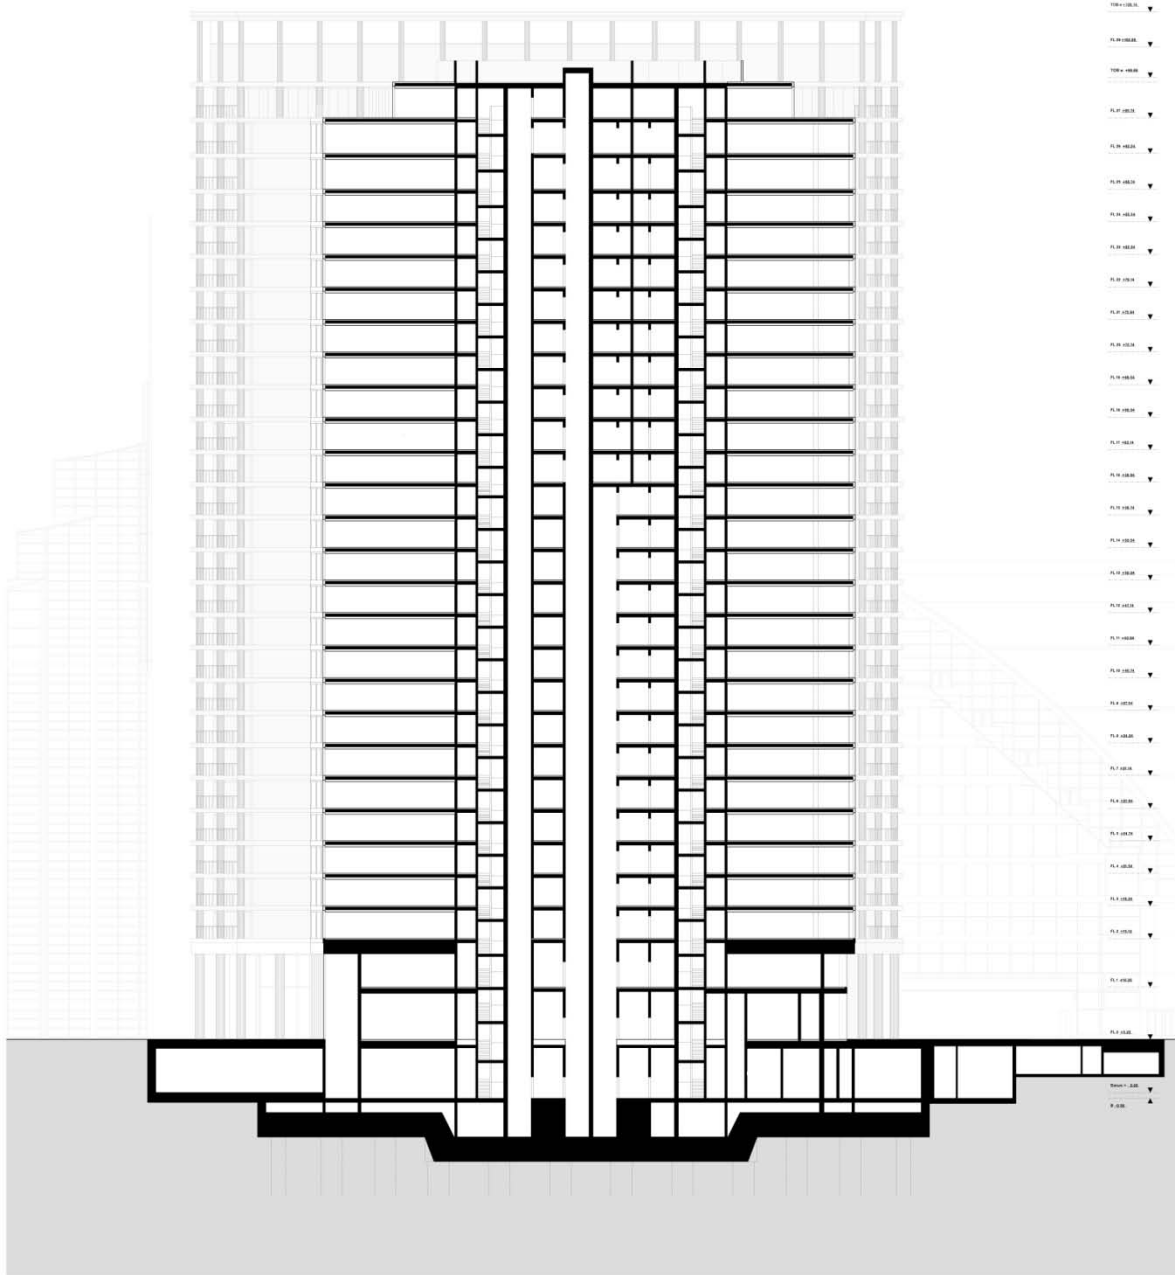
Portland House, Long Section, Proposal (DCA, 2013)
